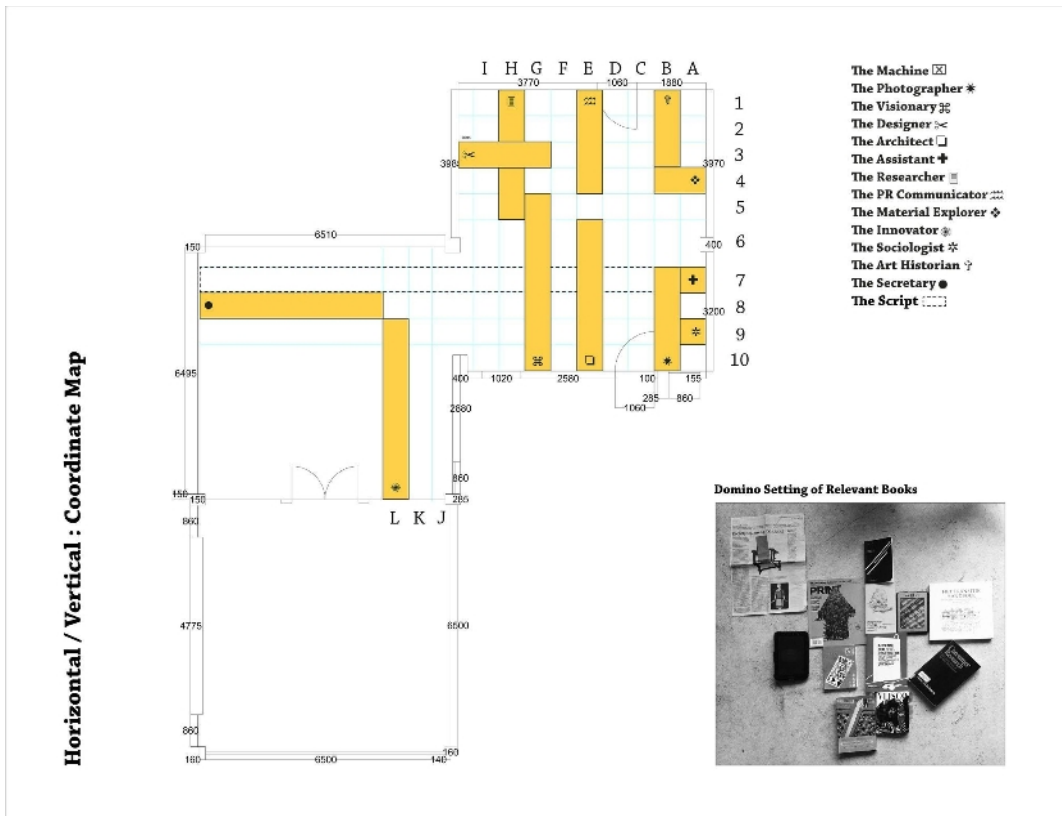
Horizontal / Vertical Exhibition Floor Plan
